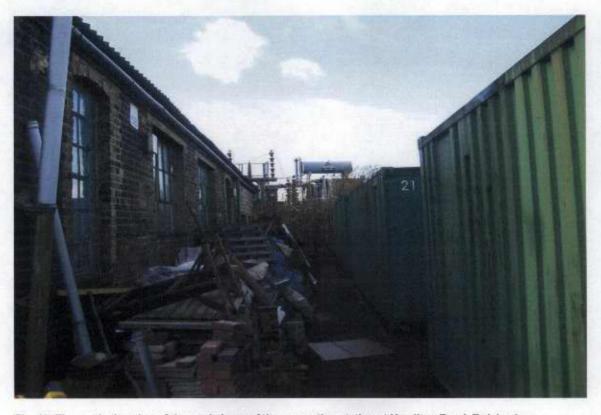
The north elevation of the workshops of the generating station at Hamilton Road, Twickenham
